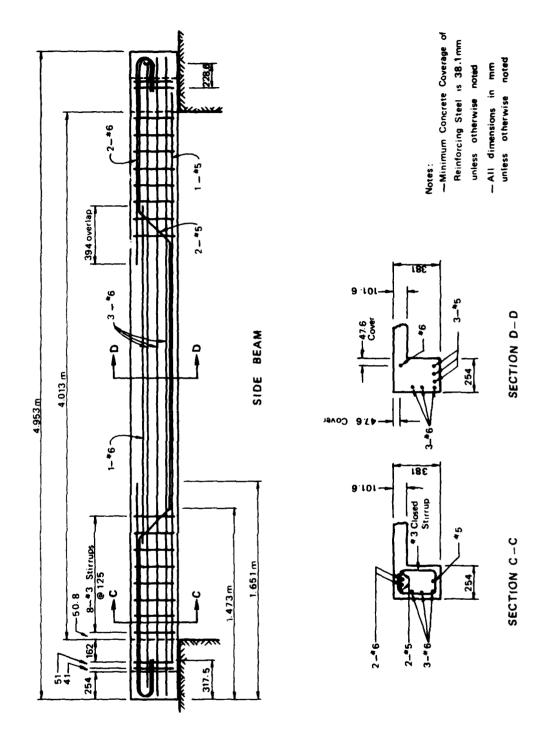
STRUCTURAL DETAILS OF SIDE BEAM - NES TEST 1
